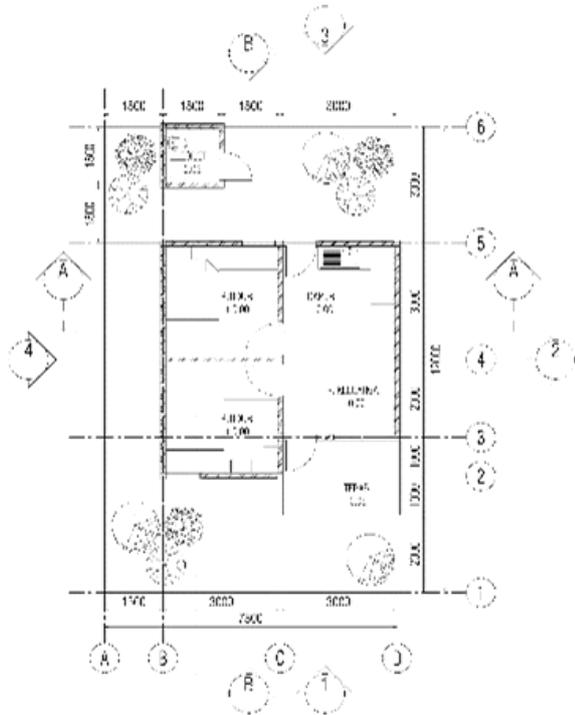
Typical floor plans of horizontal houses / row houses & facades use the local wisdom of Banten, namely the typical batik of Banten
